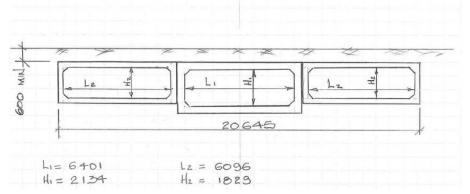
Conceptual cross-section for Structural Alternative 1A
